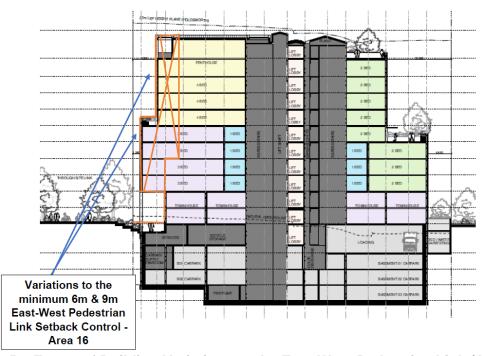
Extent of Building Variations to the East-West Pedestrian Link (Area 16)
